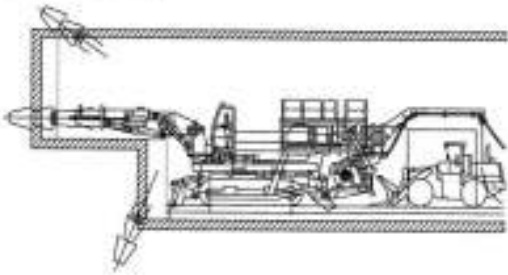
The construction of road header with single arm in Iiyama tunnel
